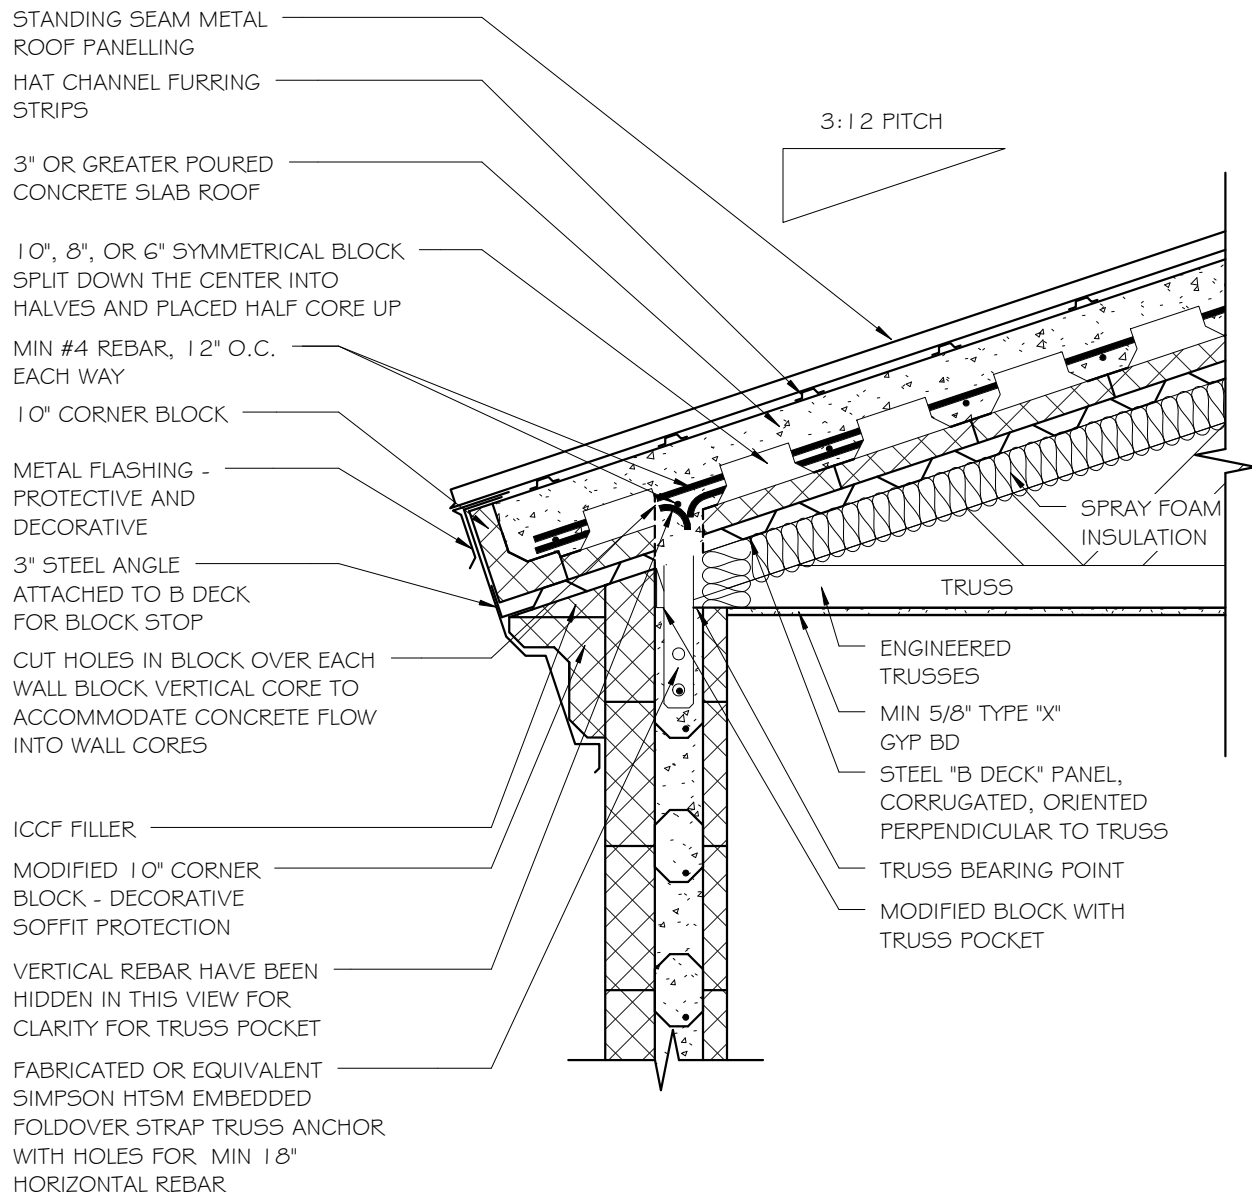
DETAIL FOR ICCF ROOF - FULL BLOCK -
